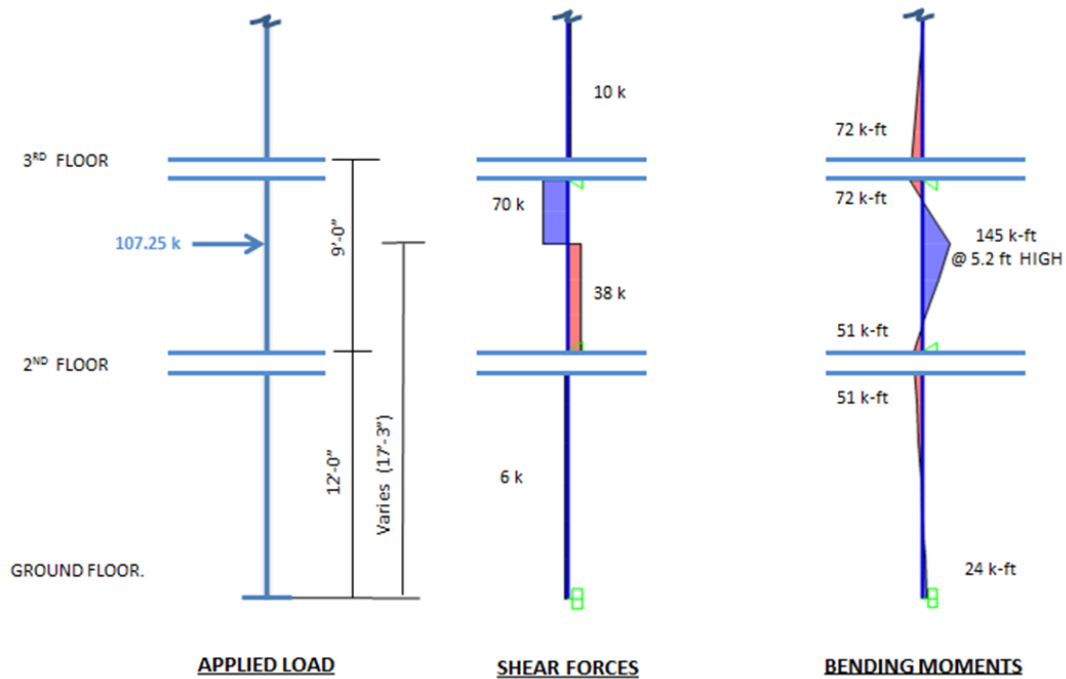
Impact load applied at " $d + h_c$ " away from the end of column on the 2ND floor
